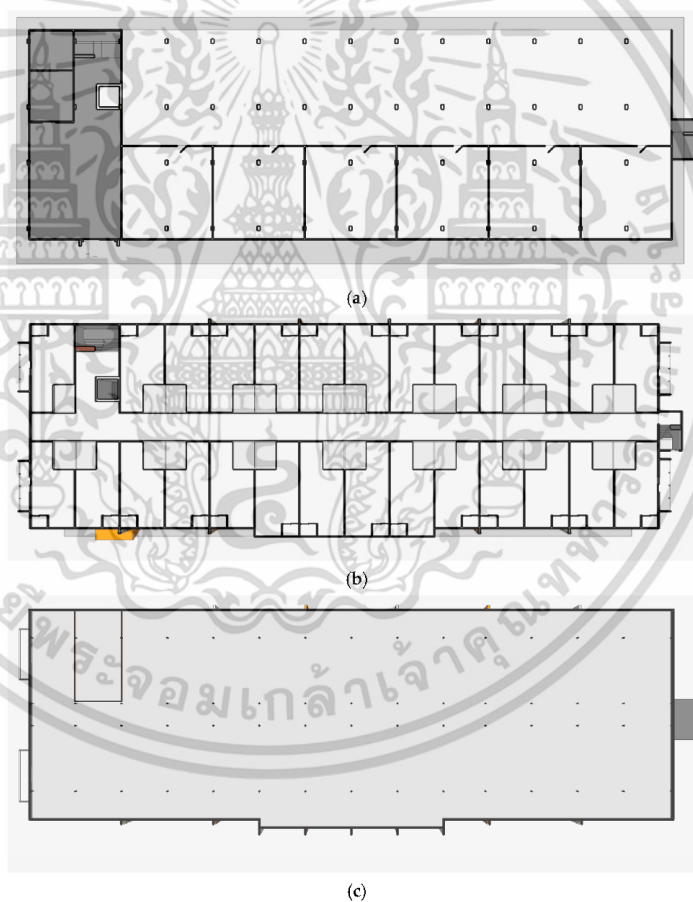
Floor plan of the case-study building: (a) First floor; (b) 2nd to 8th floor; (c) Rooftop.
